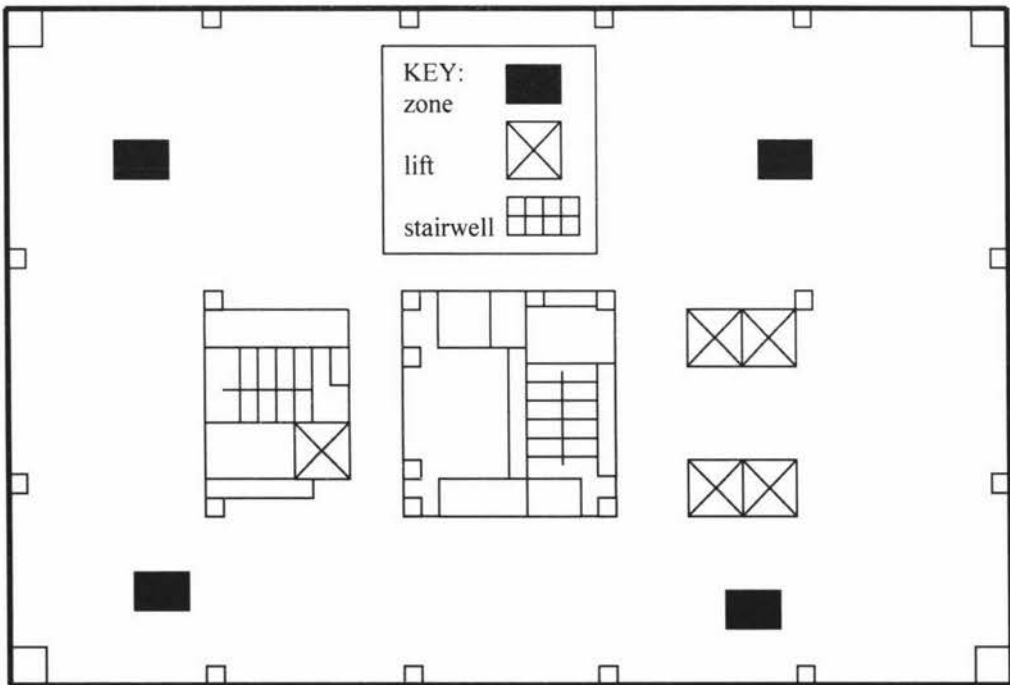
Floor plan of building four outlining the sampling zones selected on all three levels (not to scale).
